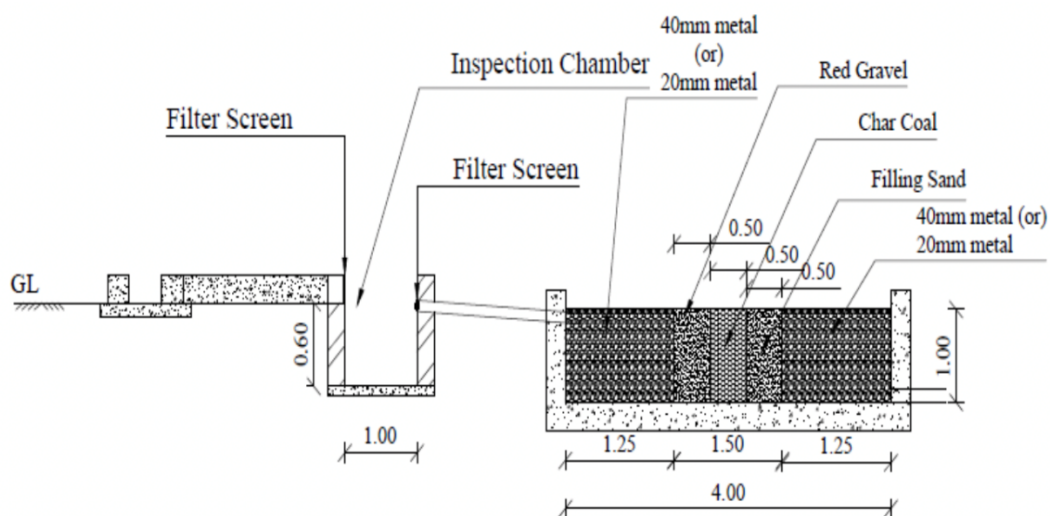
Type Design Drawing of Community Soak pit Horizontal Filter Type
